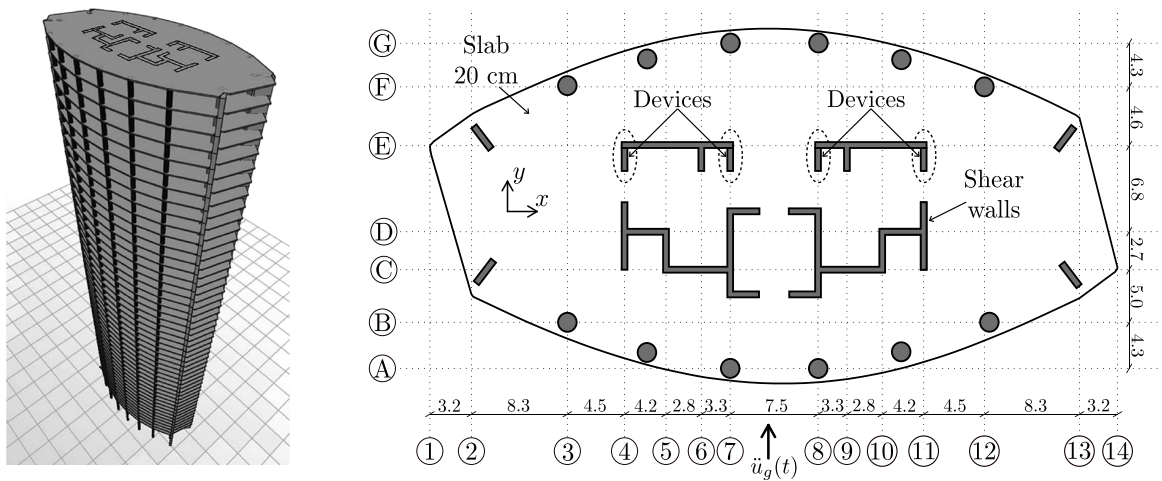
Isometric view (left) and floor plan (right) of the 52-story building model. Example 2.
